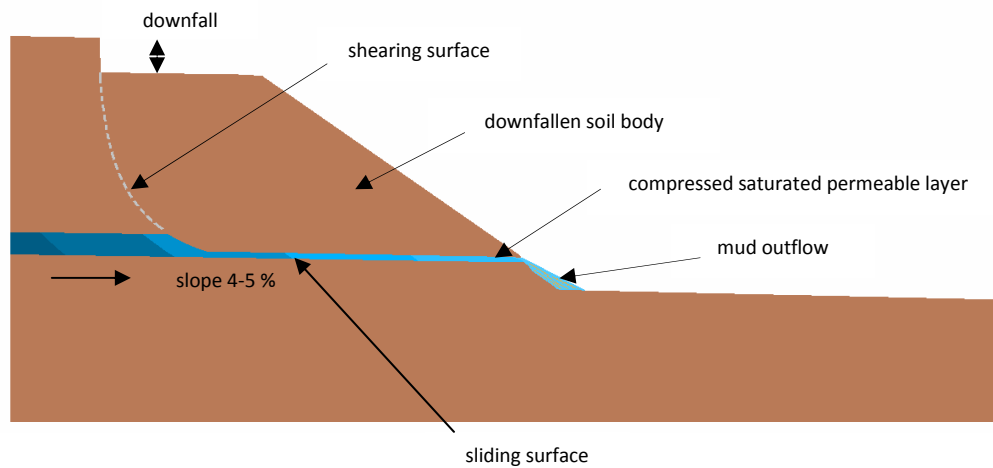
Sketch of an embankment cross section showing the first downfall above a totally saturated permeable layer
